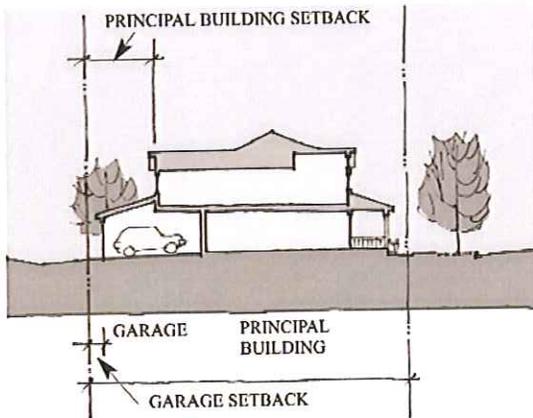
A typical Cottage Lot is shown with some 2nd story living space built over the garage to the principal building setback.
